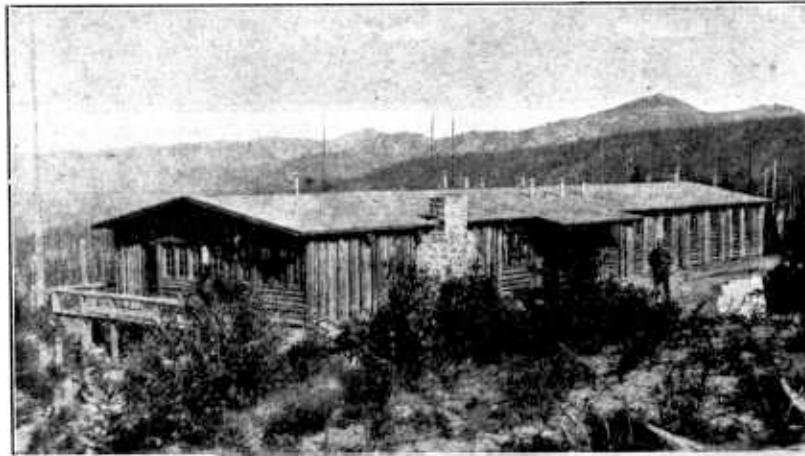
An easily built structure. Logs are used vertically between windows and horizontally at the openings
